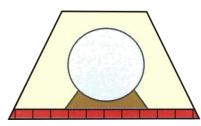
Construction of reinforcement of the foundation under the culvert with the usage of PRUDON-494 geocells
